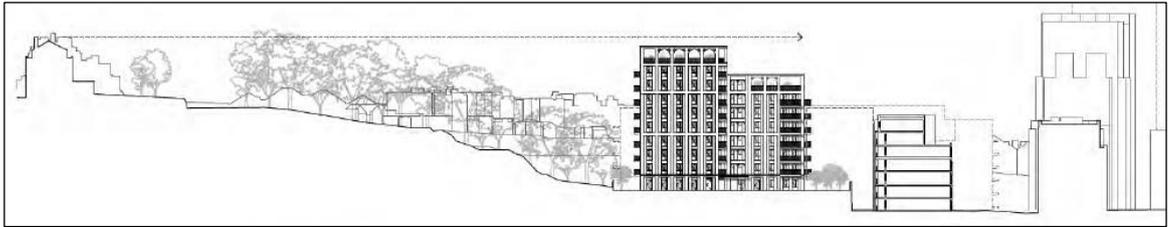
Extract takes from Proposed Plans for Block F&D: (drawing number 13.011/RM104 Rev C) at Heathside and Lethbridge Phase 4 submitted for application reference DC/14/087333
